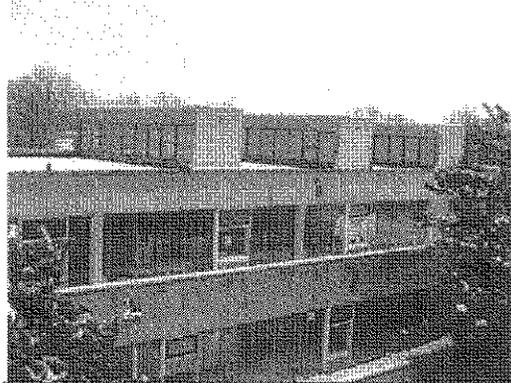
Partial overview of clerestory windows and corridor glazing for lower floors
